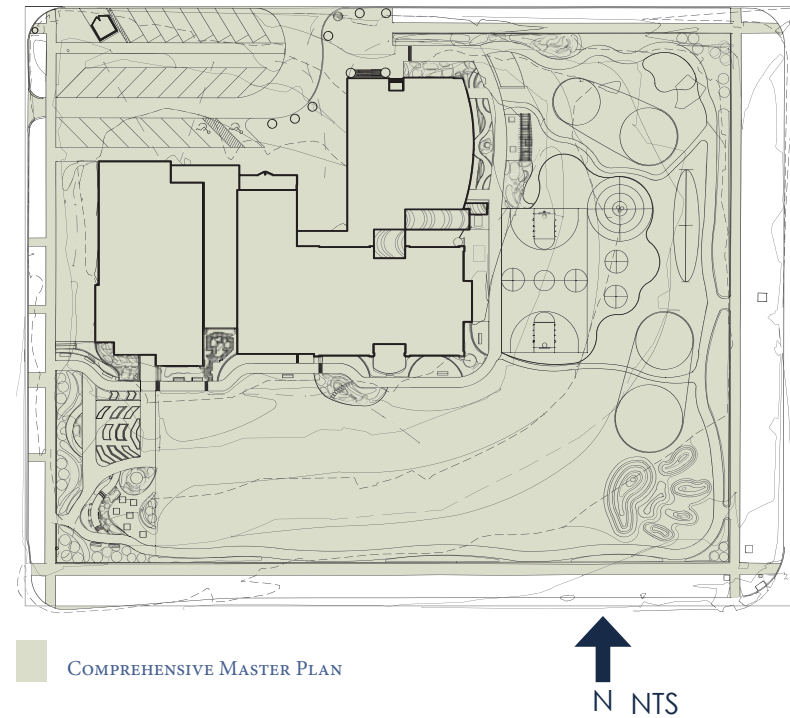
Scope of Design: Master Plan Design by author 2014.
